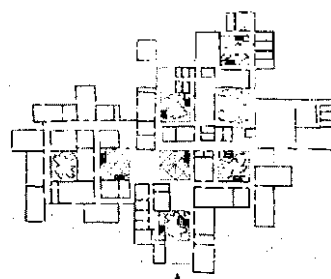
a Library Ground Floor Plan sketched by an Architect¹⁹
